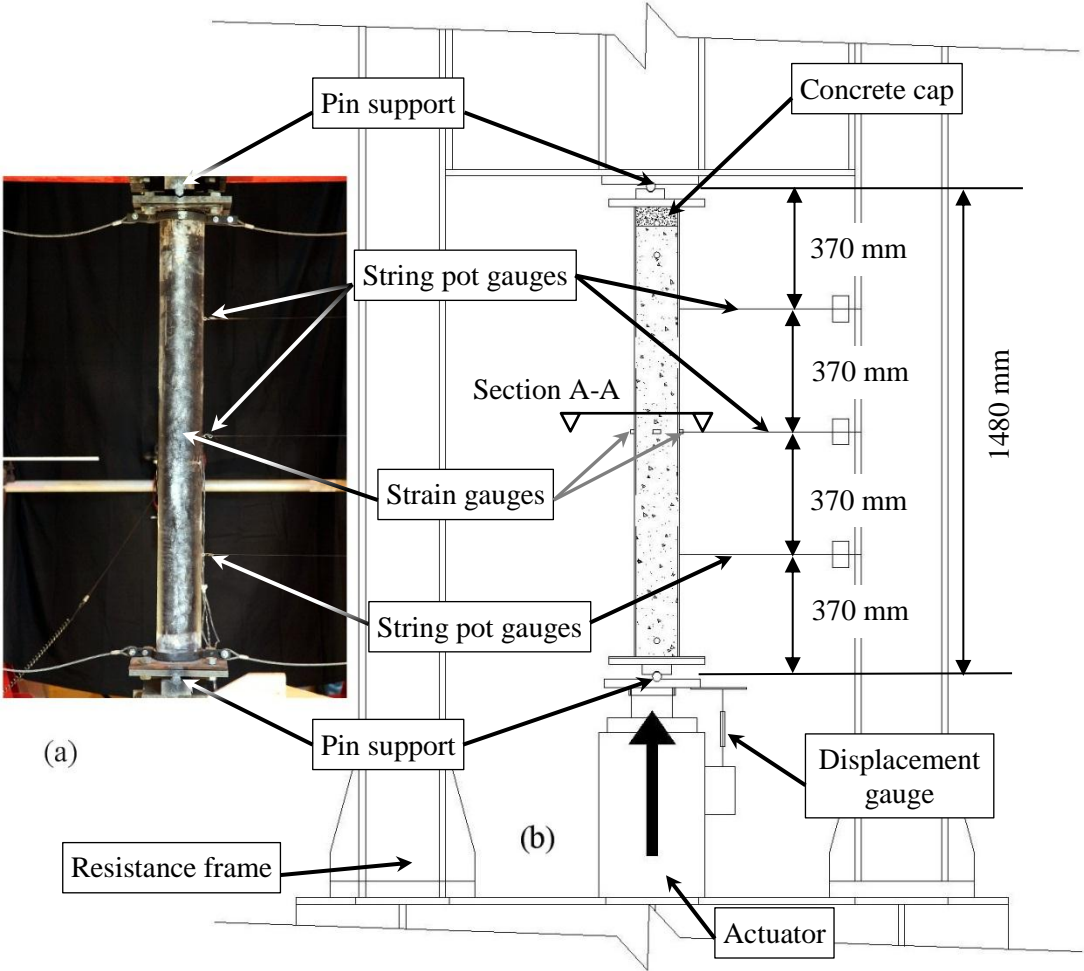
(a) Column in testing frame before loading, and (b) schematic of loading frame use in tests.
